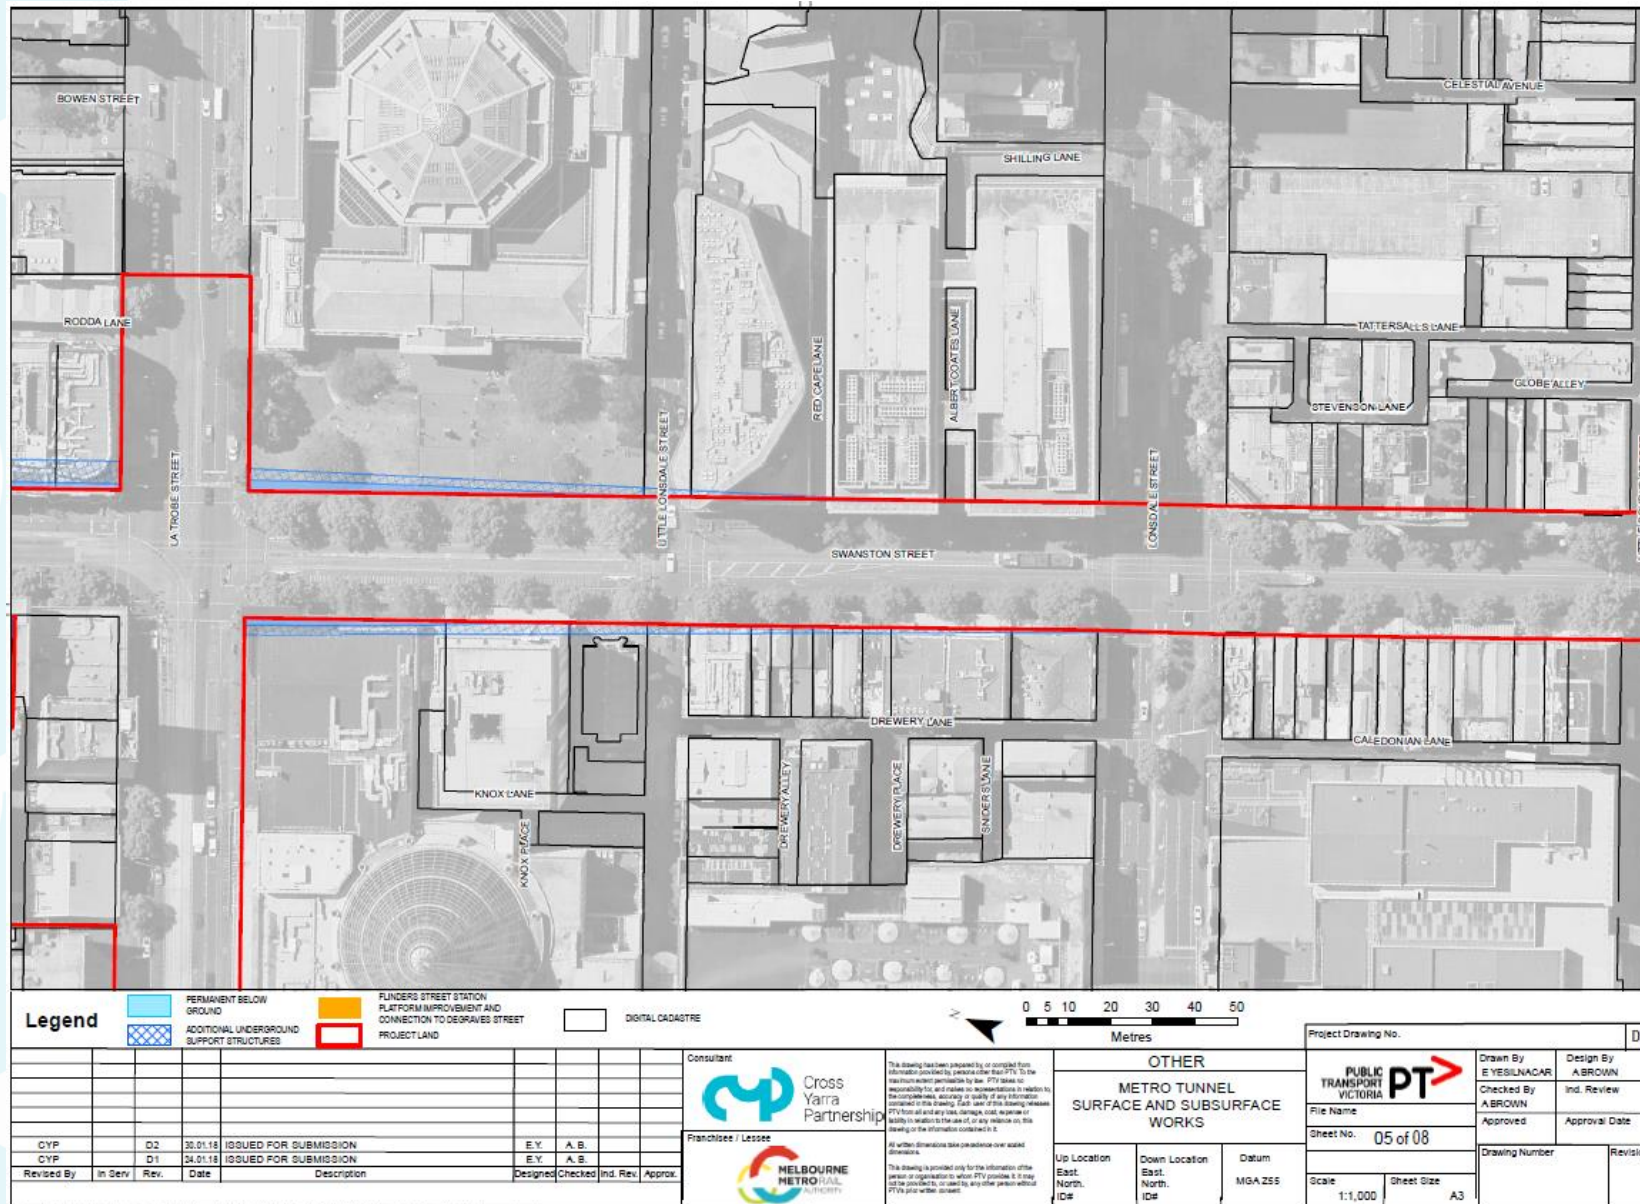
ADDITIONAL PROJECT LAND REQUIRED FOR UNDERGROUND SUPPORT STRUCTURES AND TUNNEL ALIGNMENT AT CBD NORTH STATION
